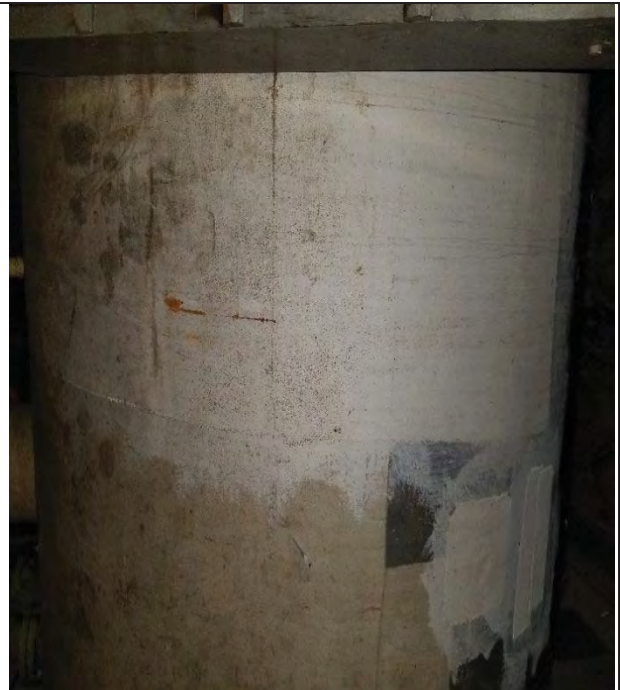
Parged pipe wrapping located in the Sewage Room 120A. Presumed asbestos containing.
